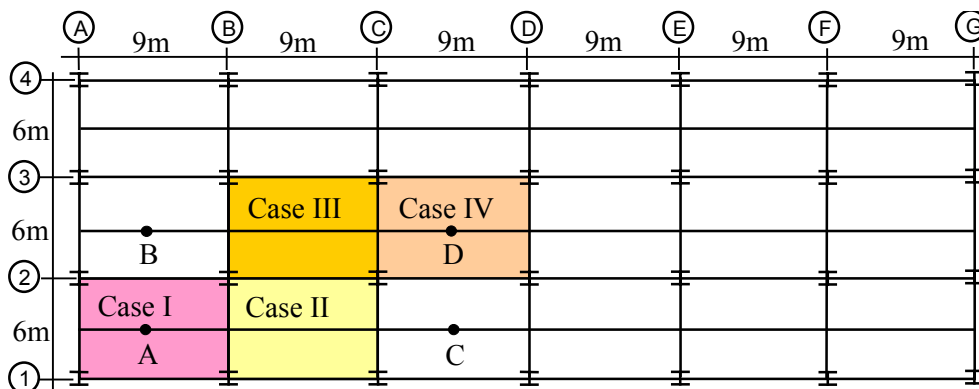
A large generic composite non-sway steel framed building with different fire compartment locations marked.
